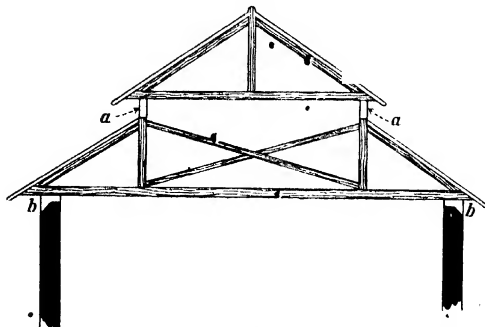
ROOF VENTILATION AS RECOMMENDED BY
